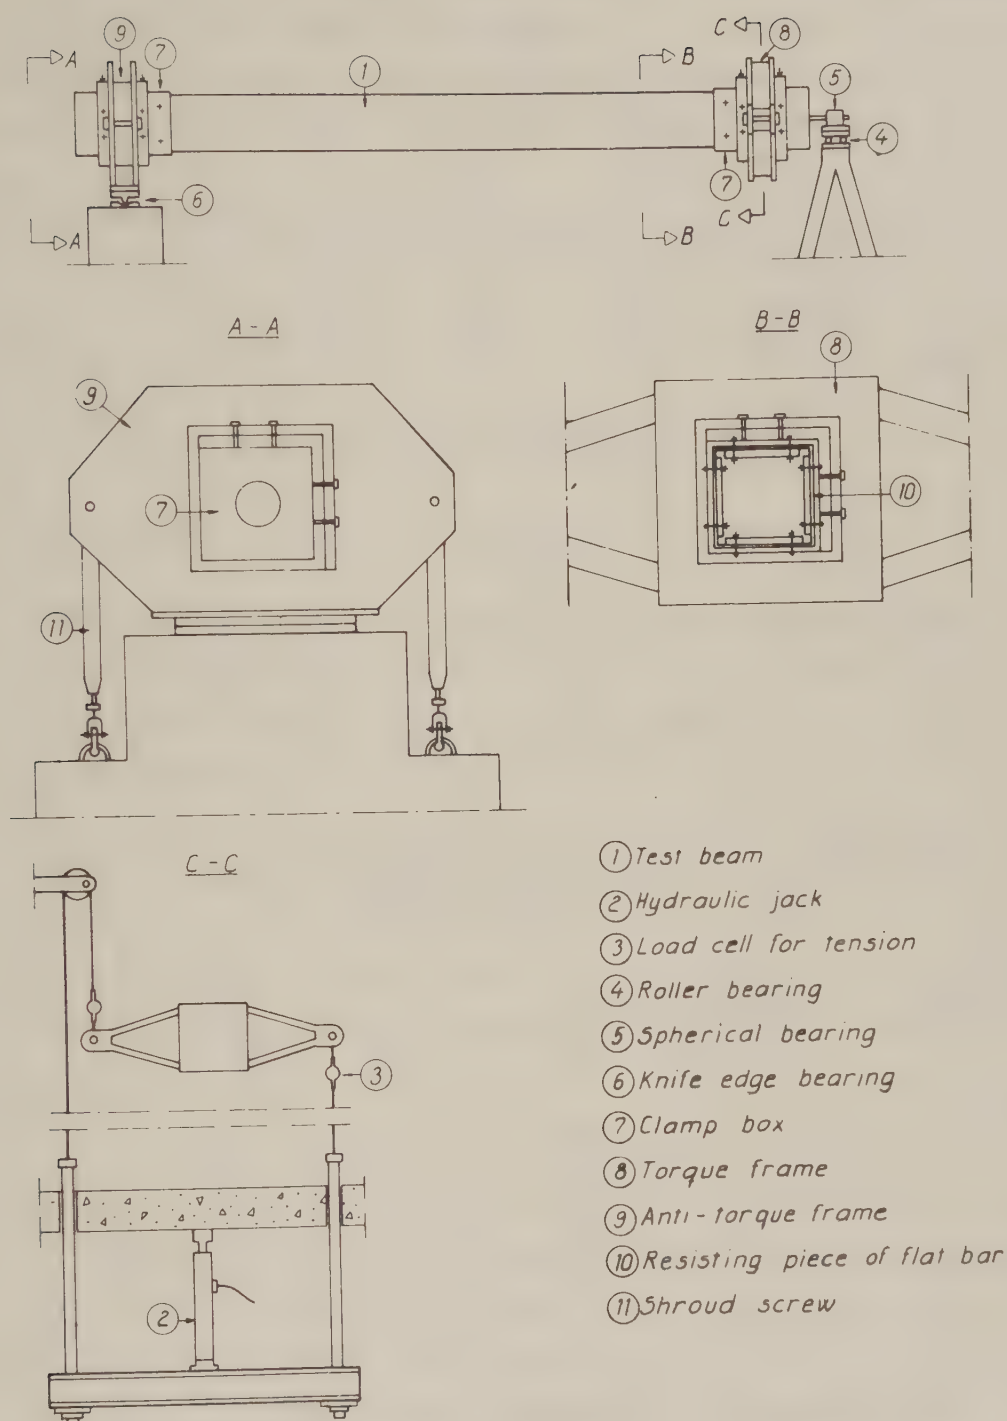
Principal arrangement of loading and support devices for test beams E1 and E2.
